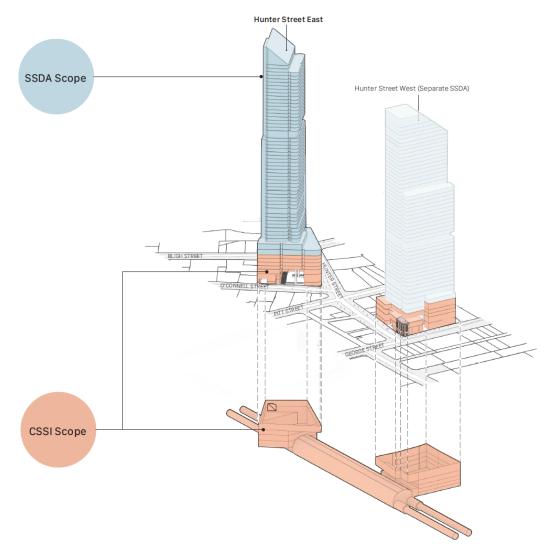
Proposed Concept SSDA development and CSSI scope
